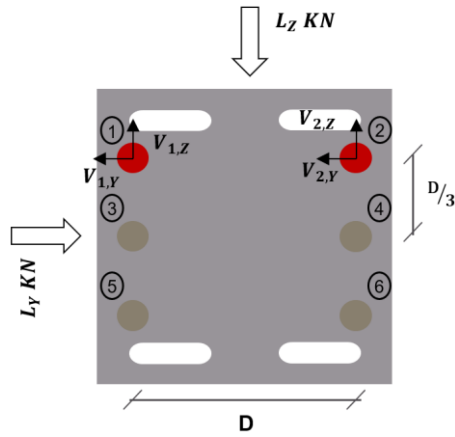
Scheme of the force in the activates fasteners, when applying horizontal and vertical loads.
